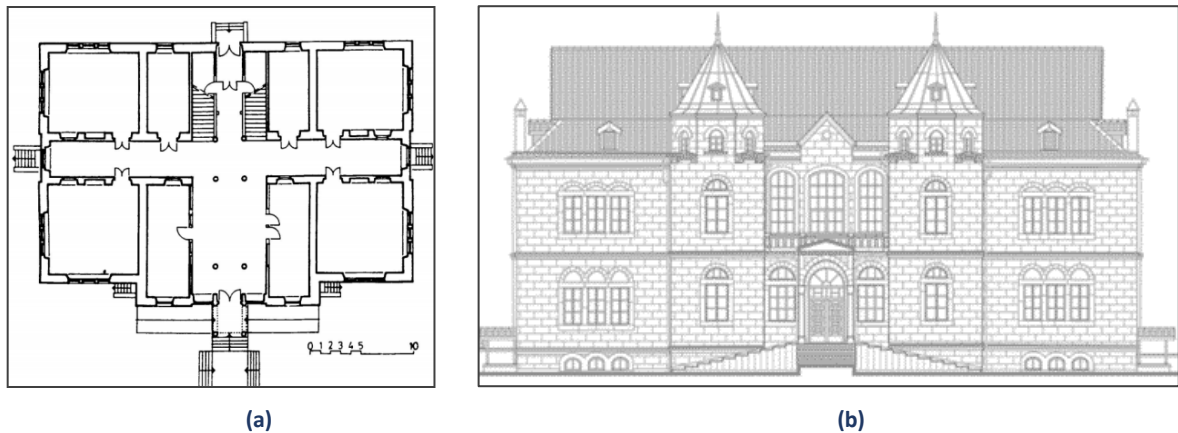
a) Sanayi Mektebi ground floor plan (Sözen, 1984) b) Sanayi Mektebi entrance facade (Çağlar, 2018)
